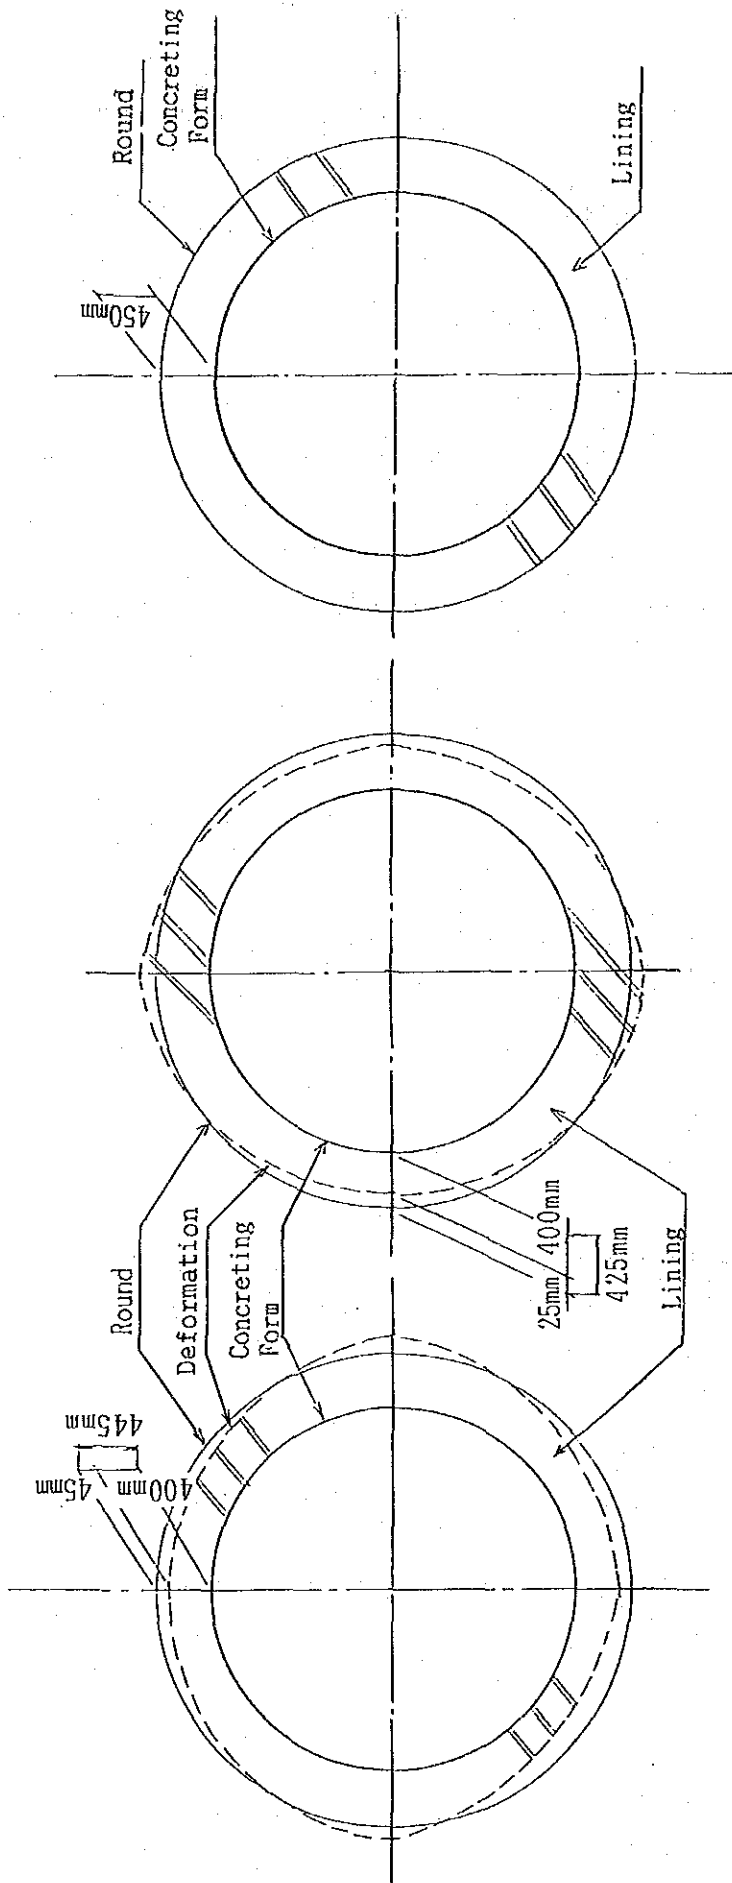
Design Condition of the Tunnel Lining Section
